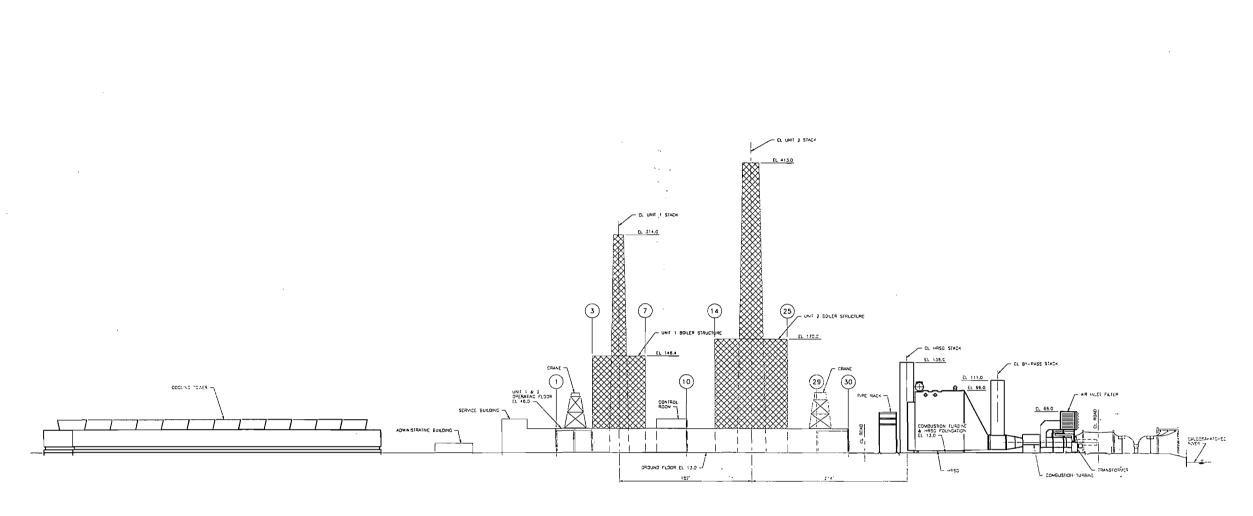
Fort Myers Plant Overall Site Arrangement
